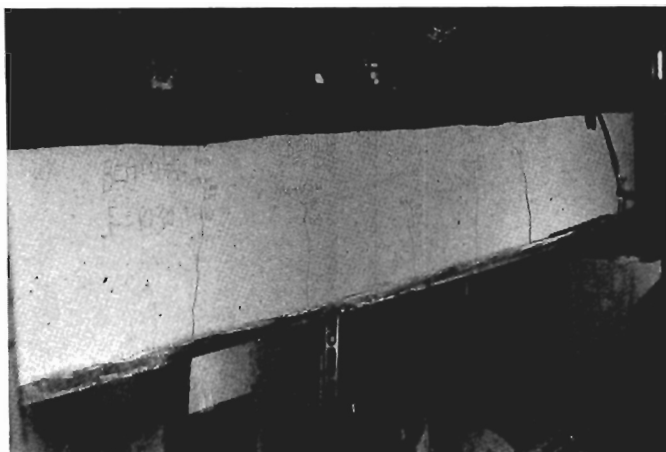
Beam No. D-3 after Failure (Bond Failure)
